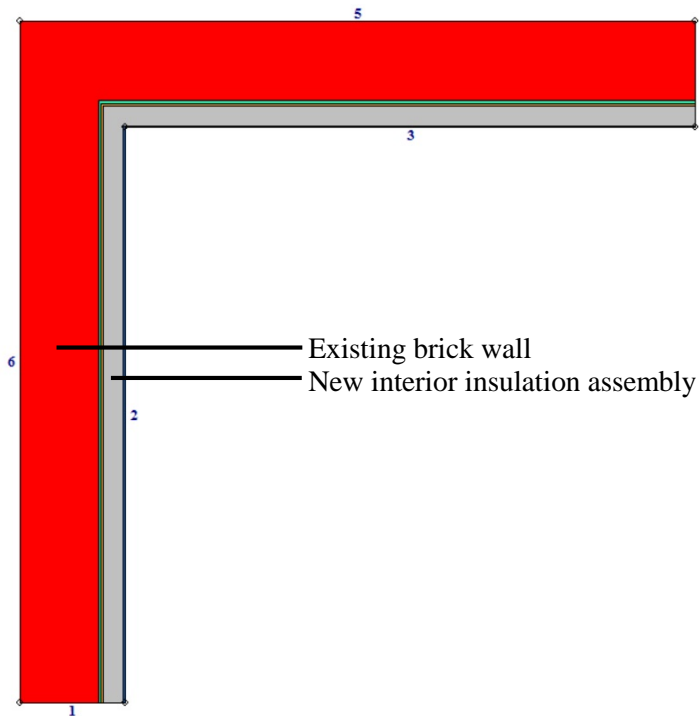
Wall corner (exterior) junction, wall assembly H (Illustration by the author)
